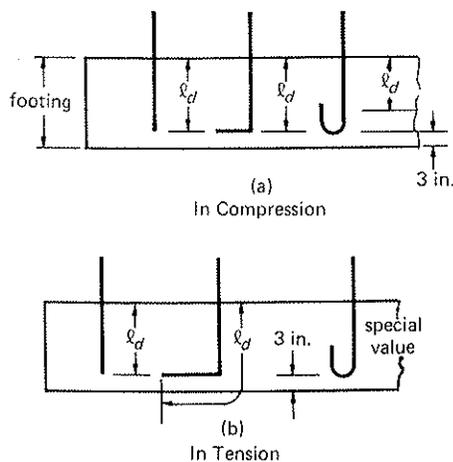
Development (anchorage) of column bars or dowels. (a) In compression; and (b) in tension.
